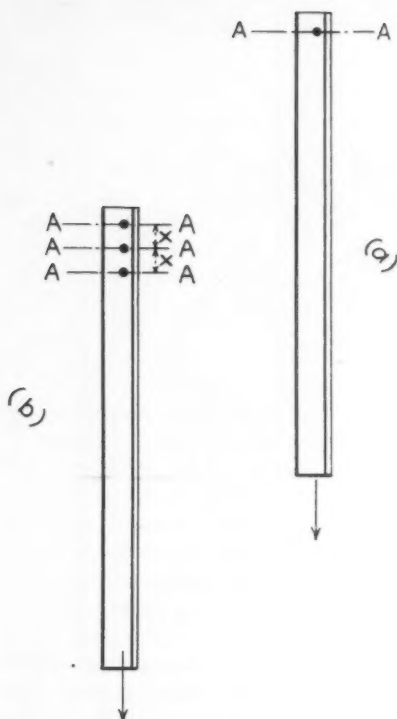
In riveted tension angles, there is waste in detailing three rivets where one will carry the load.
